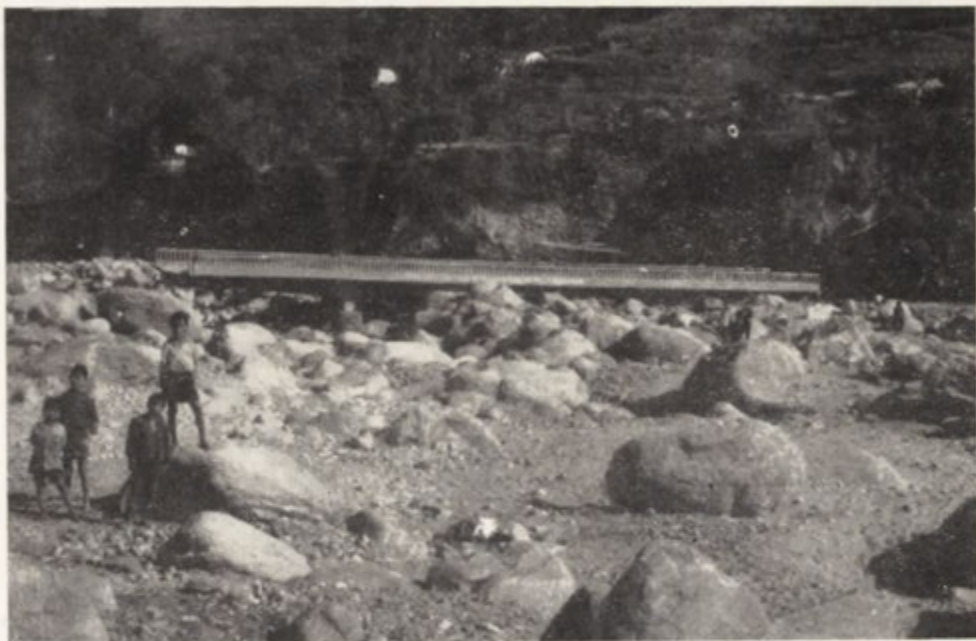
New bridge in Pul Bazar 40 feet high. After flood it looks like a island ranging a little above boulder plain
